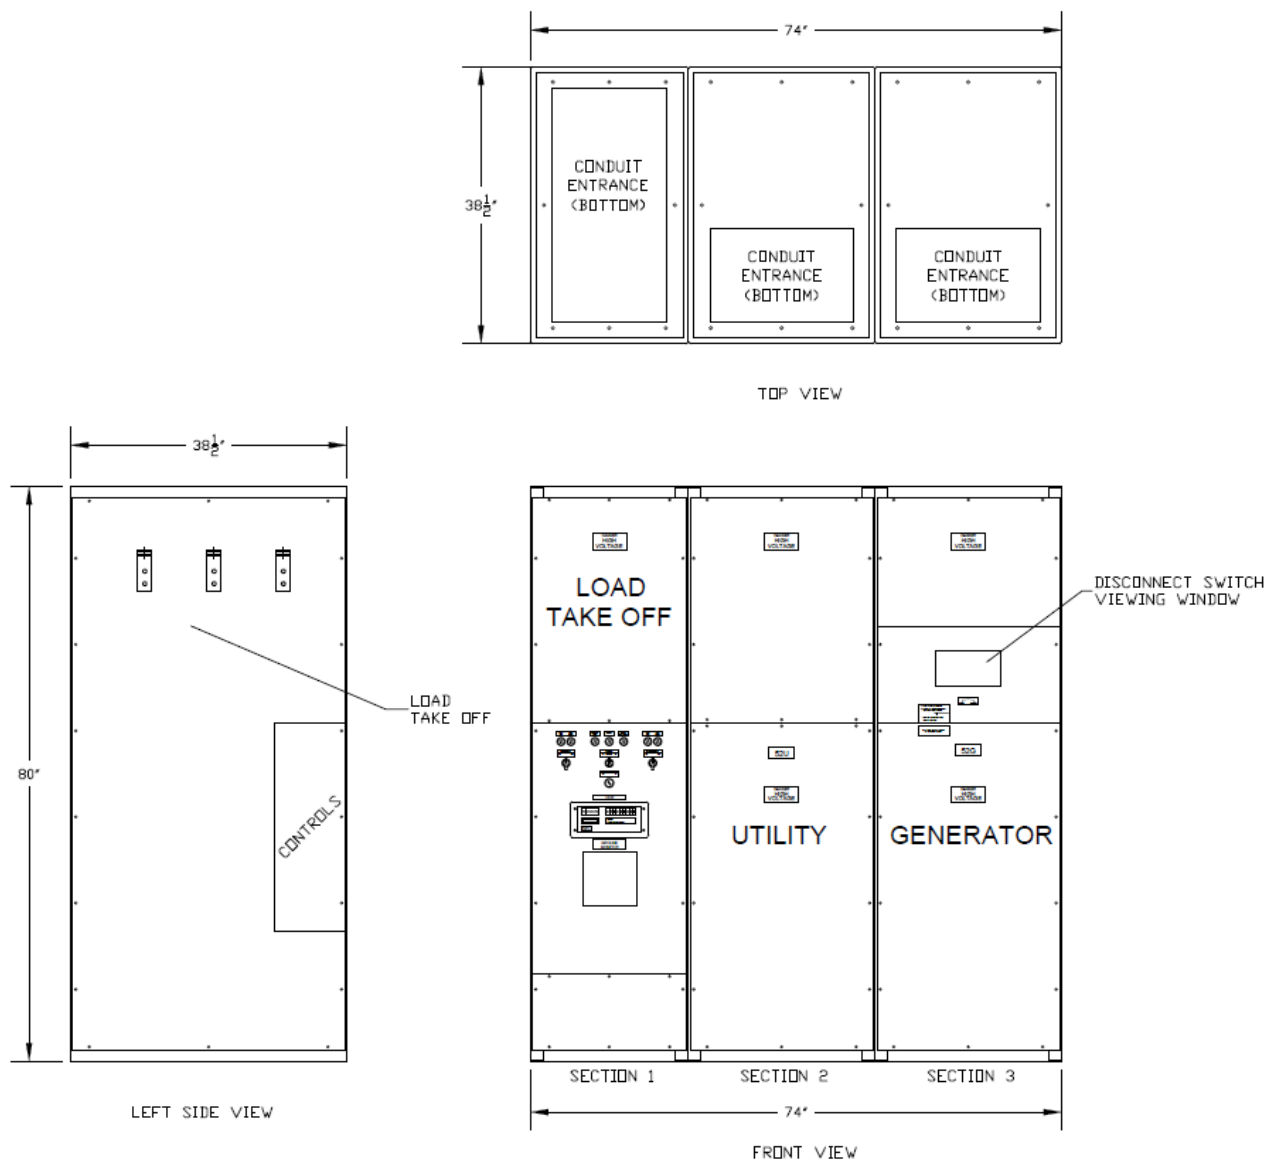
5 kV Metal-Enclosed Switchgear Front, Side, & Top Views – Dimensions
